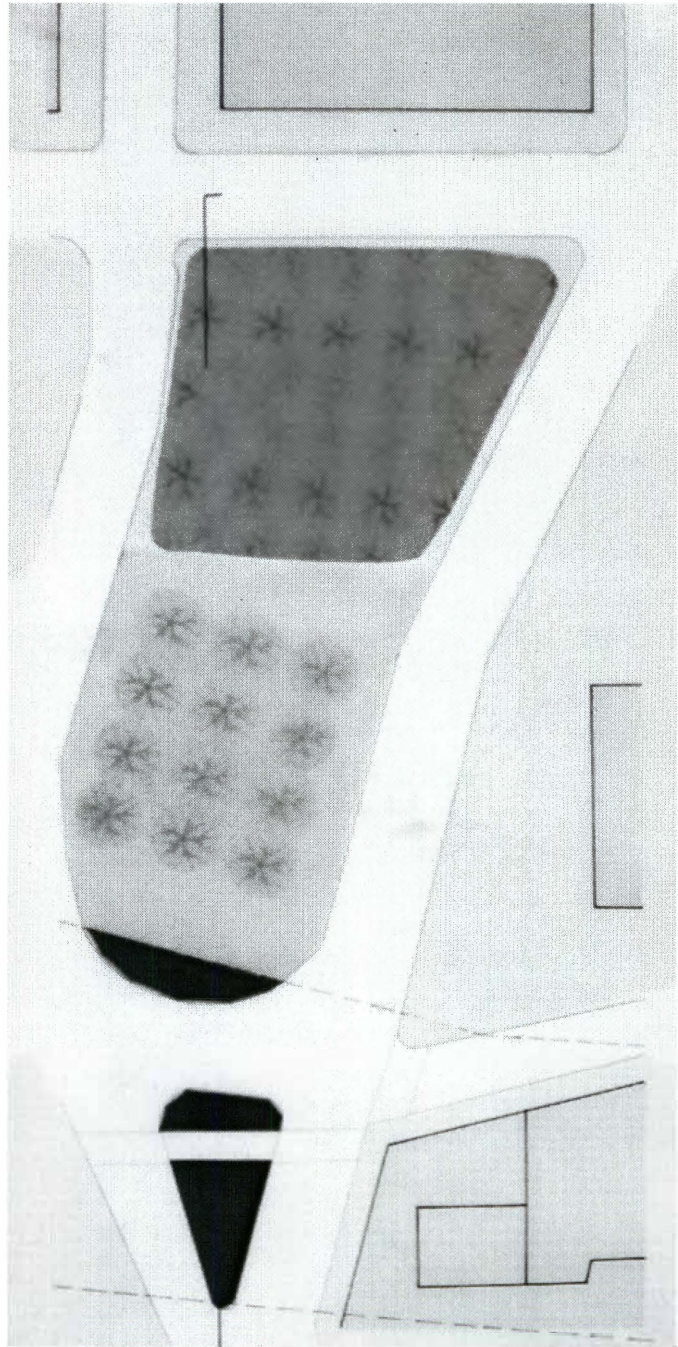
SITE PLAN - URBAN THOROUGHFARE
